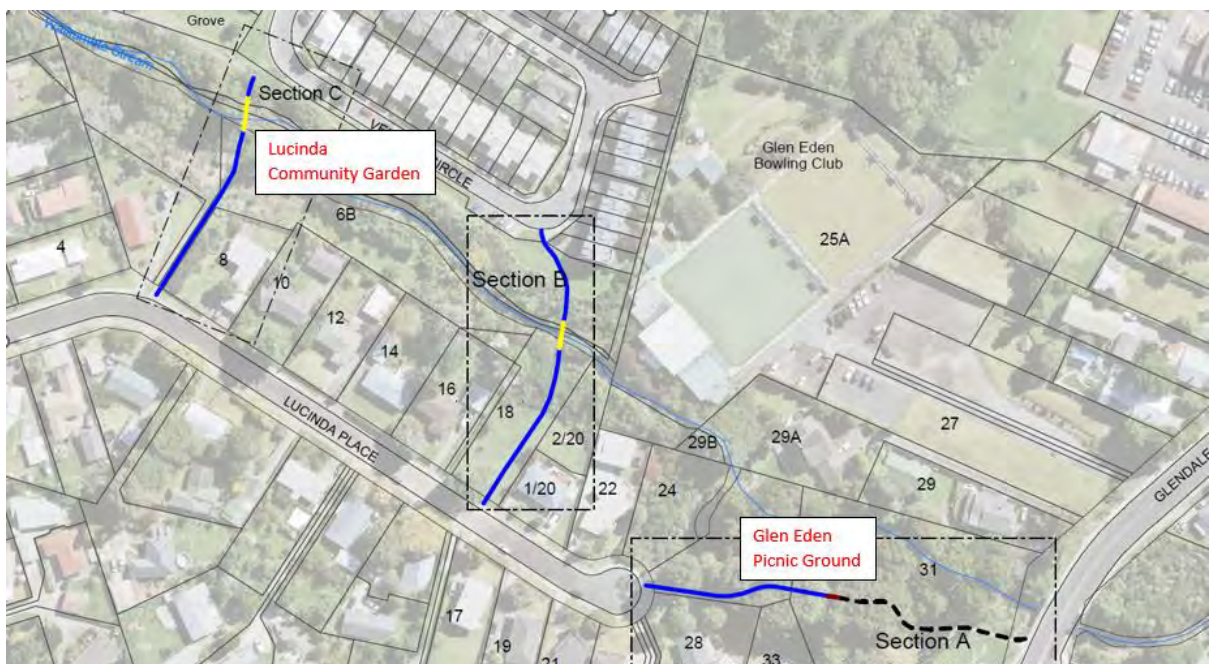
Two route options – section B: connection via #18 Lucinda Pl and section C: connection via community garden. Also shown is Section A: path between Lucinda Place and Glendale Road.
